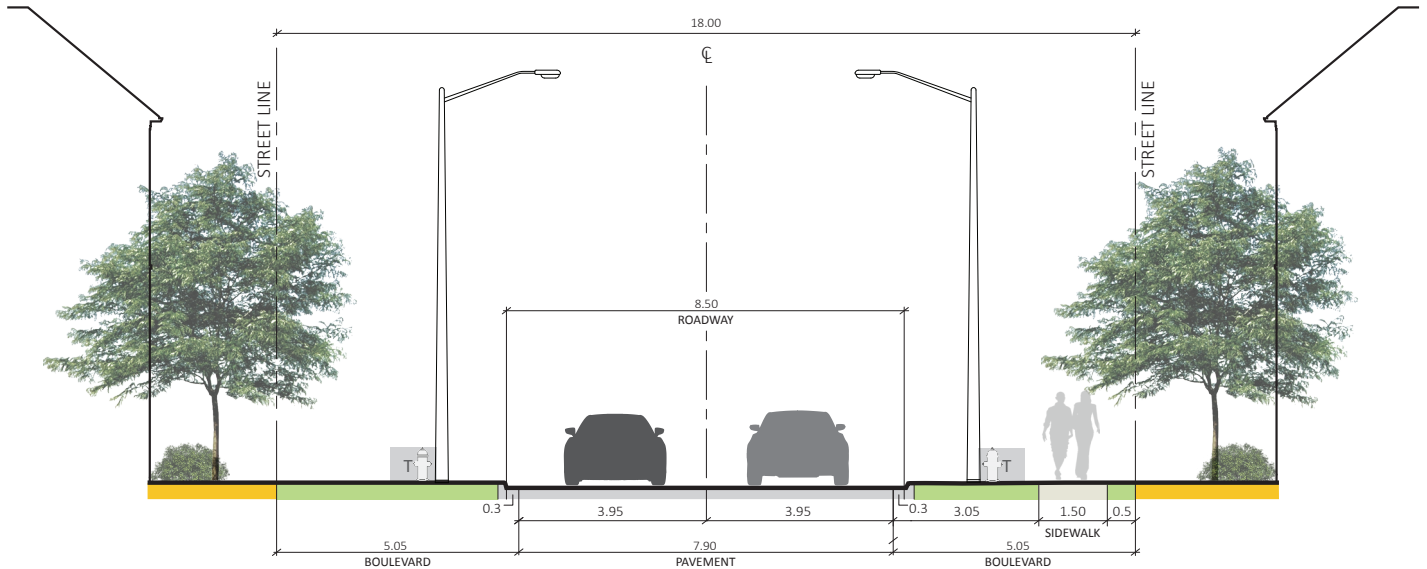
Local Street (18m R.O.W.) Cross-Section
